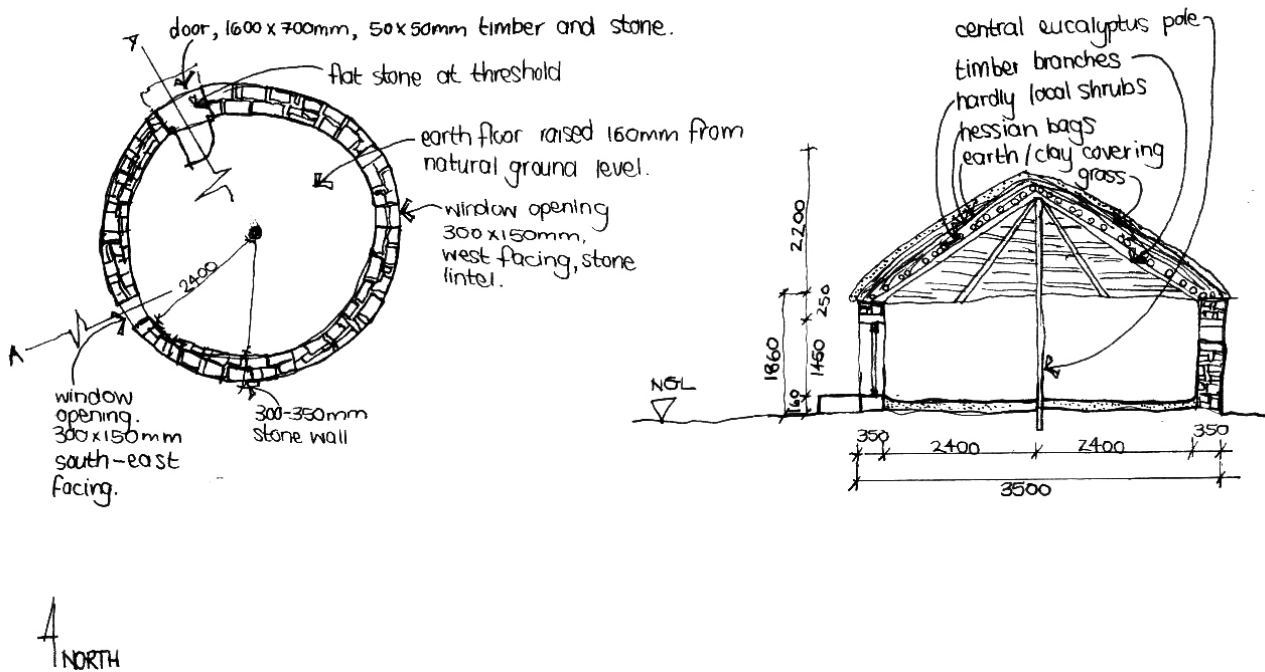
Sketches illustrating the method of construction used for the R391 rondavel
